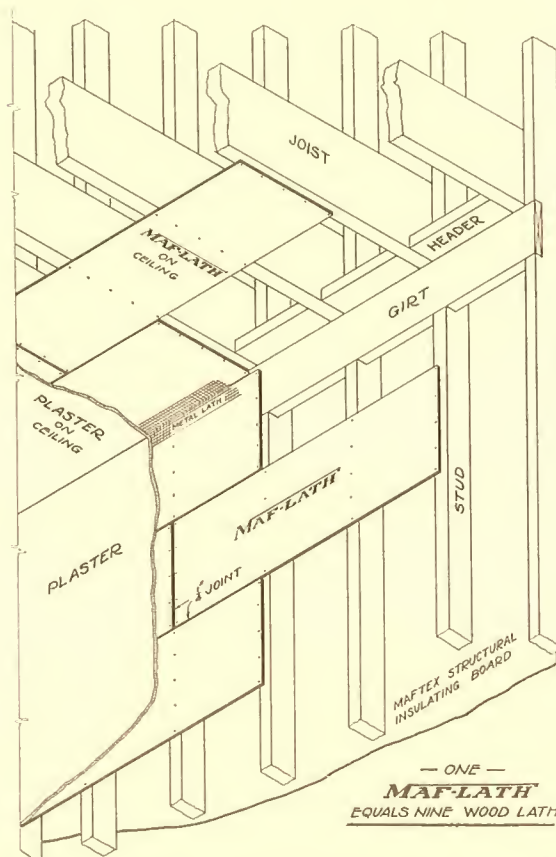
MAF-LATH applied as a plaster base on ceiling and side wall construction.
